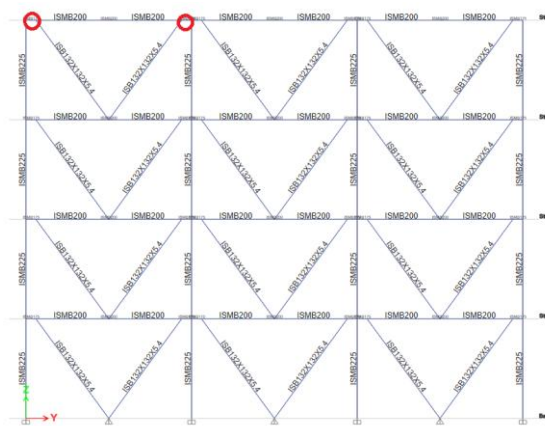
Section of steel building showing V shaped bracing and EDB in corners.
